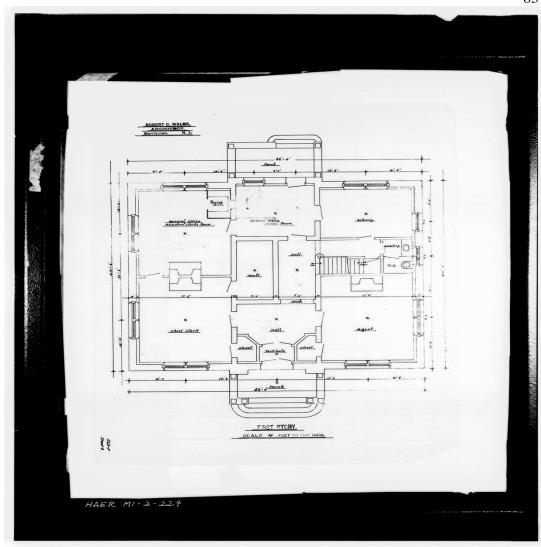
Original first story floor plan of QMC office with labeled rooms and dimensions. Photograph courtesy of Library of Congress, HAER Documentation, Quincy Mining Company.
